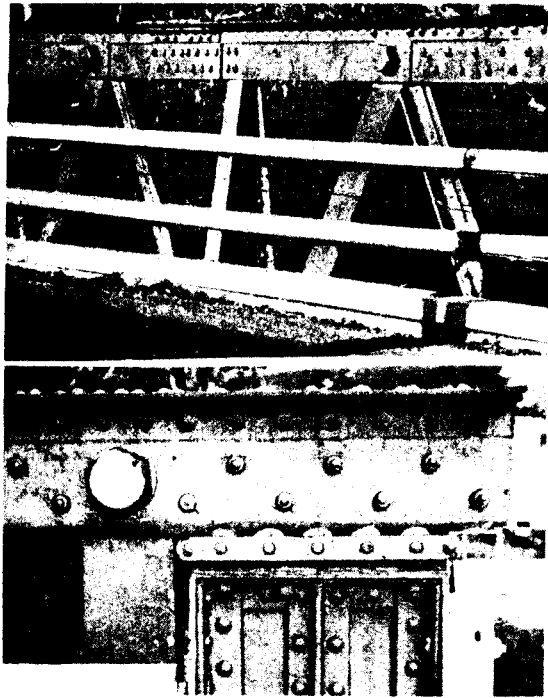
These Warren railway trusses near Werrington are over 100 years old. They were acclaimed as examples of local engineering skills.
